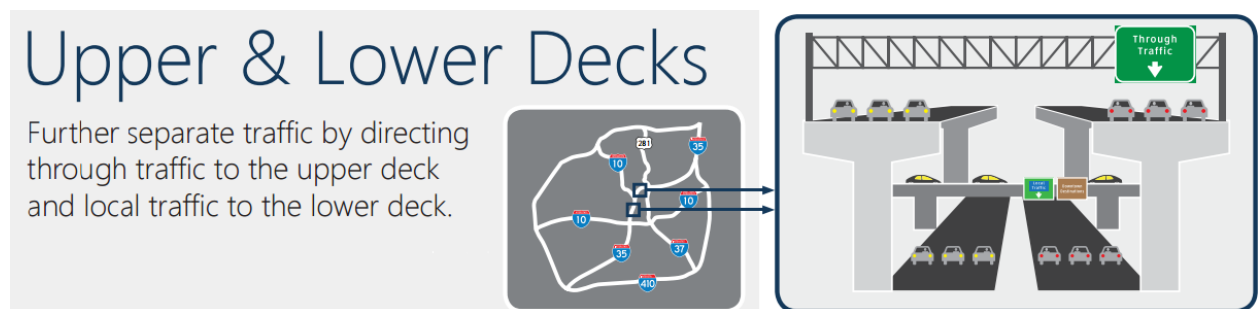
Elevated through lanes under consideration in downtown San Antonio
